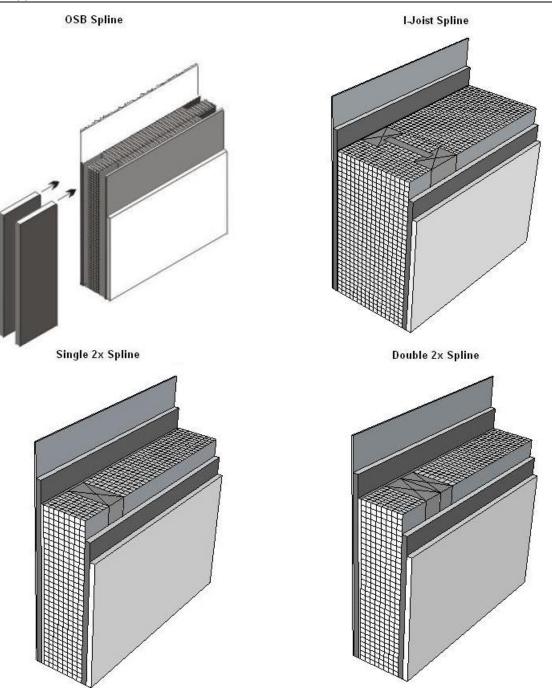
Structurally Insulated Wall Panels (SIPS) This figure shows just one way that panels are connected. Other options exist.
